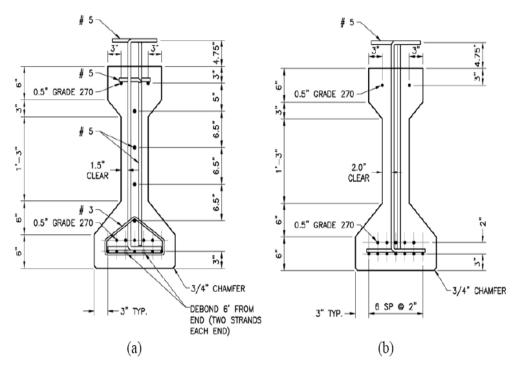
AASHTO Type II cross-section at the (a) end and (b) middle of a girder (Hamilton and Labonte, 2005).
